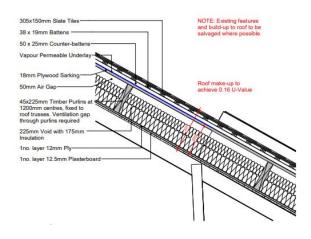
Extract of Proposed Section showing Make Up of Internal Lining of Roof
